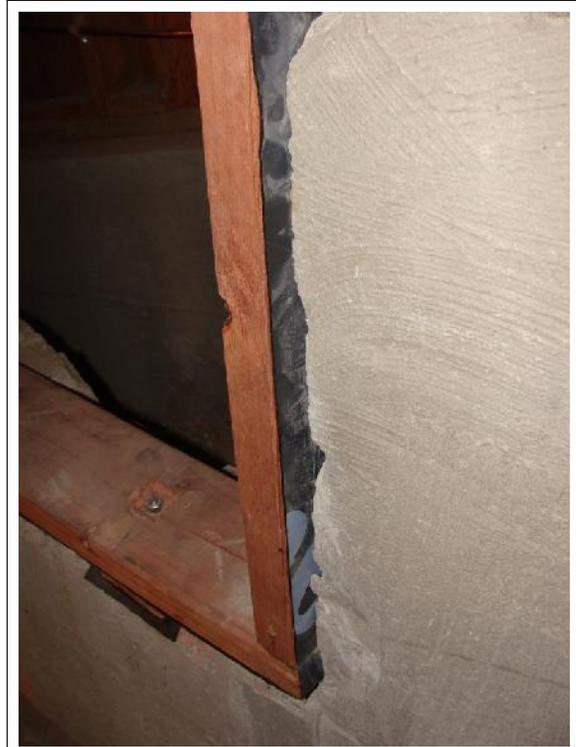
Untreated lumber shown here is protected from moisture wicking through the concrete foundation wall by “peel-and-stick” membrane (also called self-adhered flashing, commonly used to waterproof around window and door openings).
